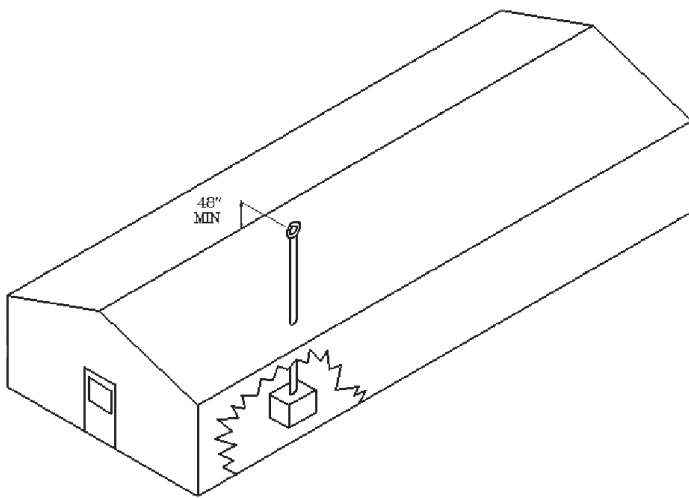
All greenhouse heating units should be vented to the outside. Top of vent sack should be at least 48" above the roof peak.
